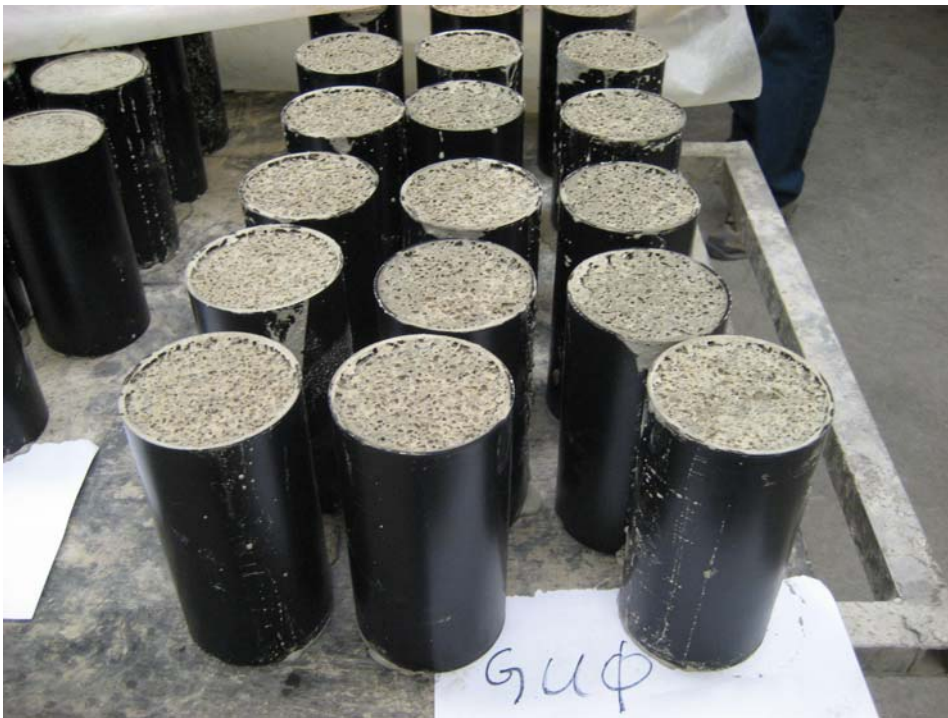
Shrinkage of W.R. Meadows – CG-86 Cylindrical Specimens
